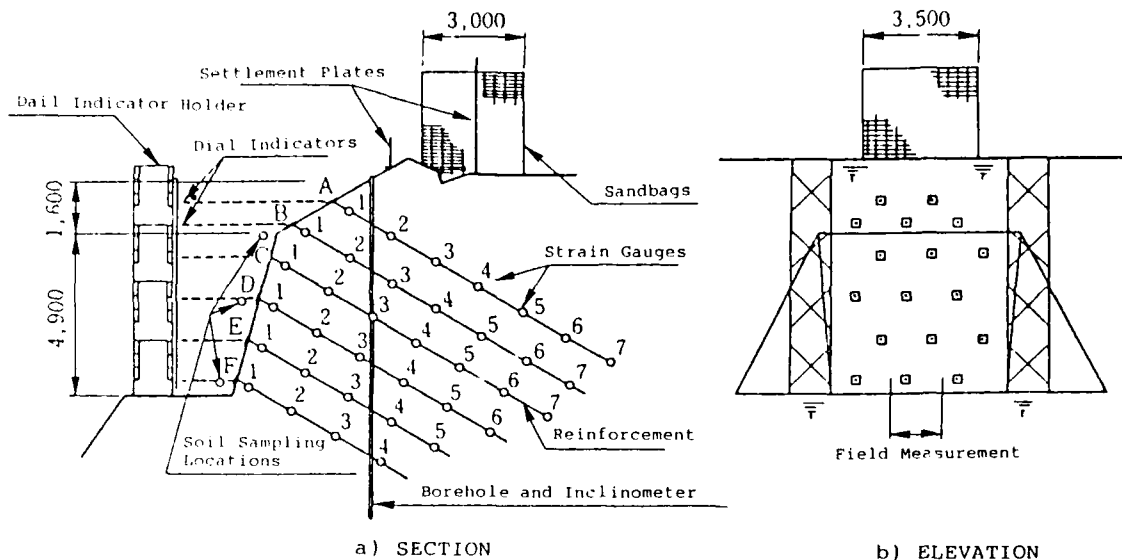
Section and Elevation of the Reinforced Slope for the Field Test
